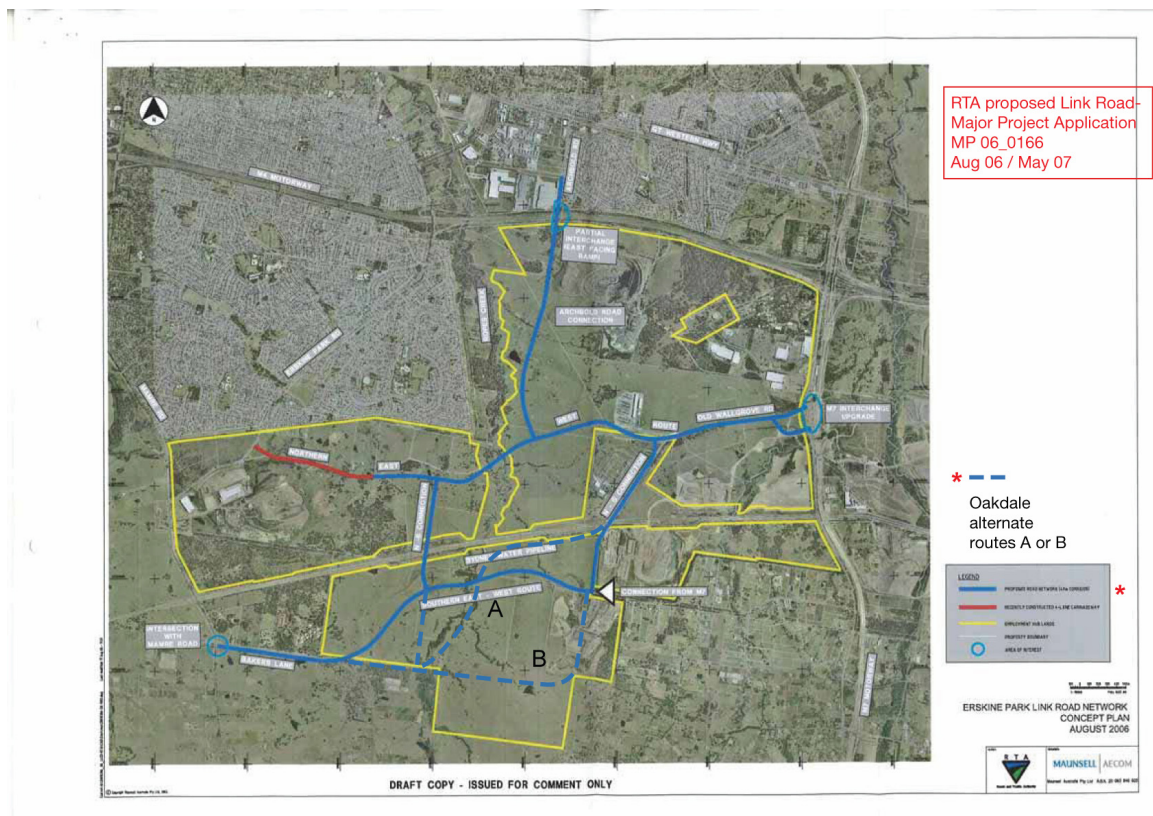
RTA Major Project Application (MP 06_0166) – *Link Road* Network
